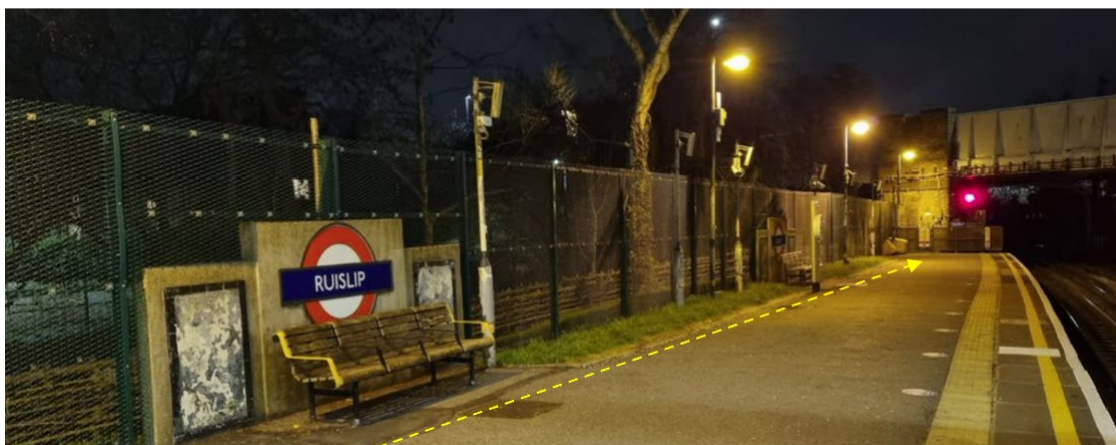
OTC – CRMS route exit from Room 1/481 to platform duct route to Platform 1 (Headwall)
